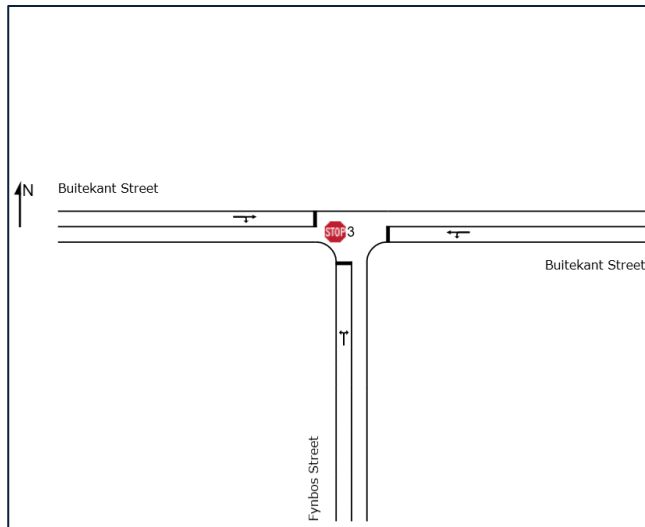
Buitekant Street and Fynbos Street: Existing Layout
